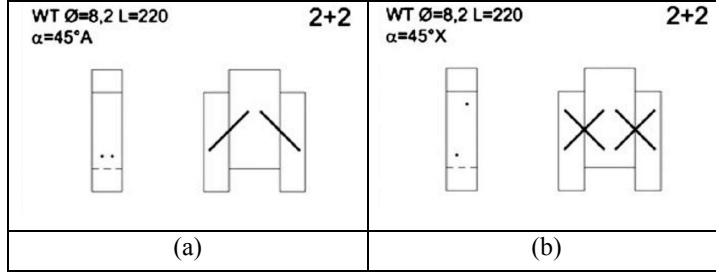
Two examples of push-out tests joints configurations tested by Tomasi et al., (a) screws in shear-tension or shear-compression, (b) Cross-screw joint configuration - (Tomasi et al., 2010)
